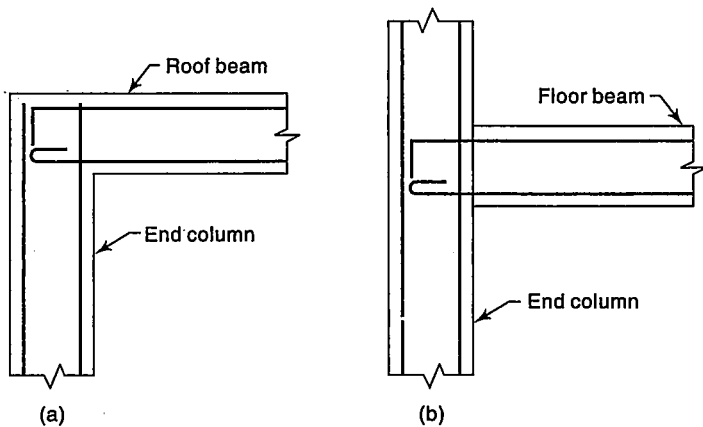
Some beam-column connections in reinforced concrete structures (not recommended)
